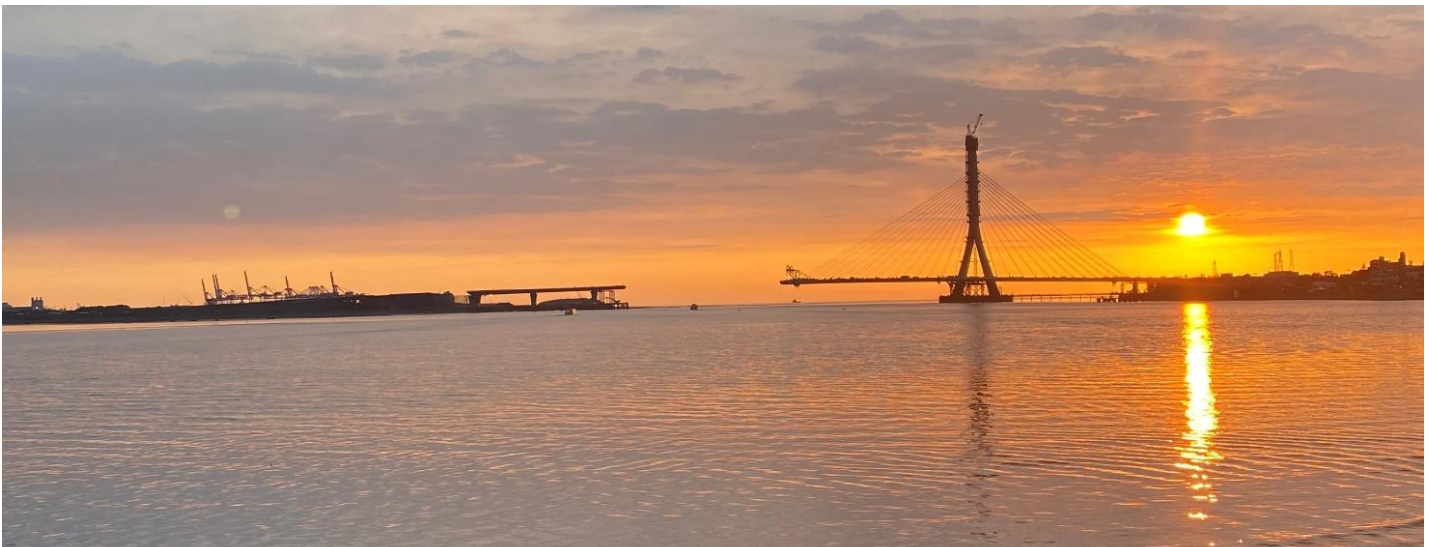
Sunset at Danjiang Bridge with ~50% of cables installed (May 2025)
